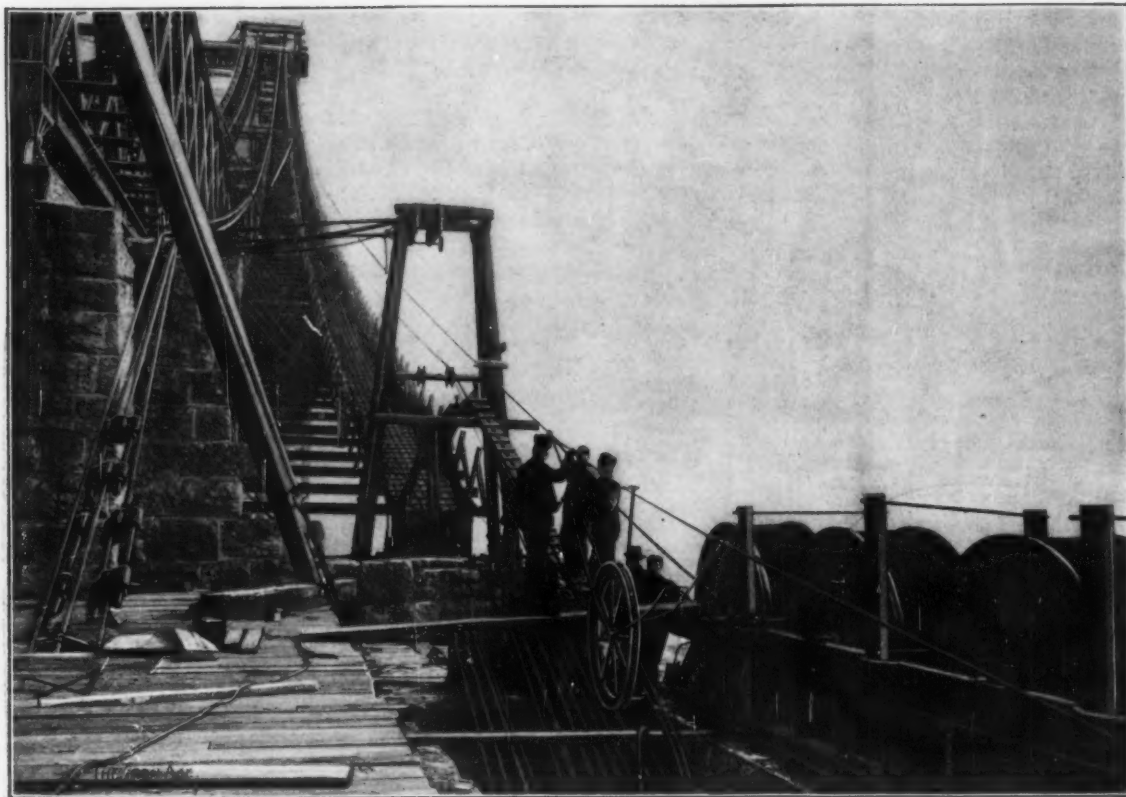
Looking from Anchorage Toward Tower. Anchor Eye Bars and Wire Reels in Foreground.
